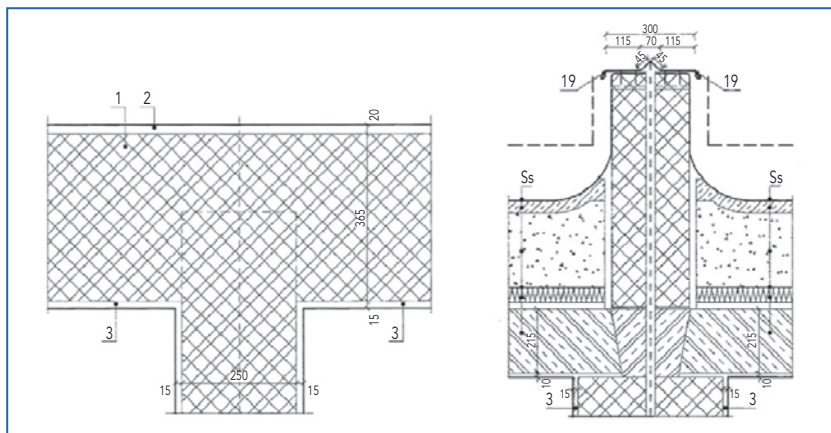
Wall detail (left – plan view, right – section of dilatation) of multi-family house types T01B to T03B, [9].
